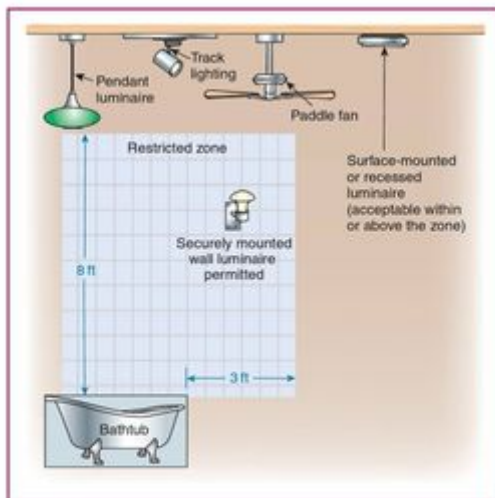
Luminaires, lighting track, and suspended (paddle) fan located near a bathtub.
